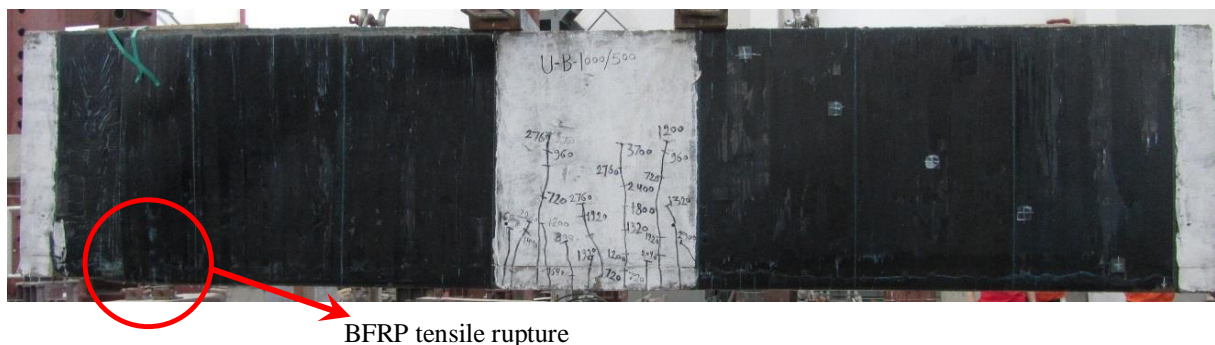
Strengthened beam crack pattern (U-B-1000/500)
